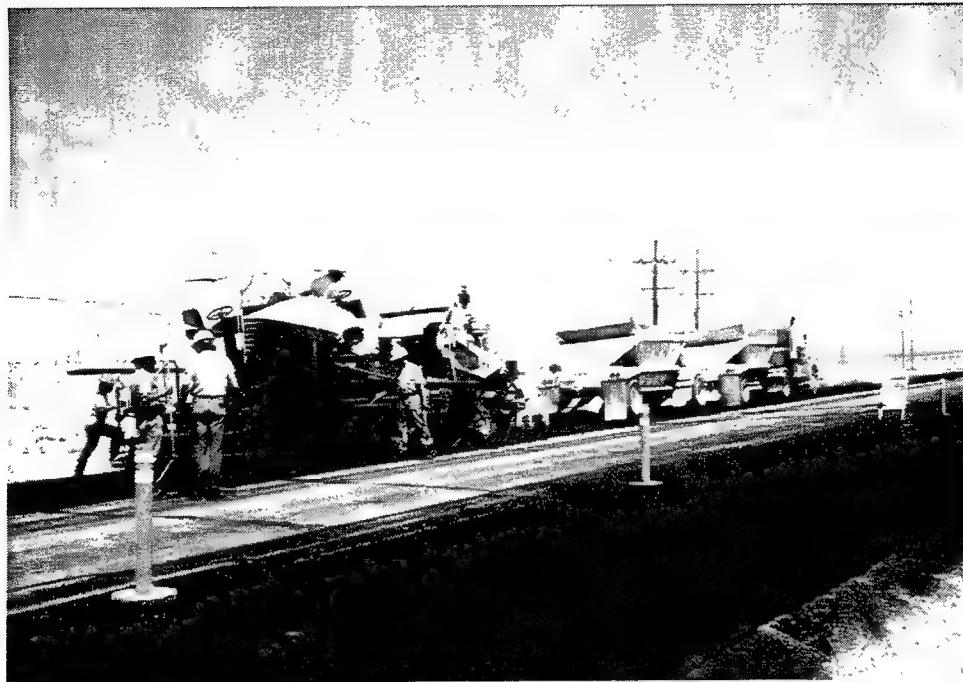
Belly-dump trucks placing SMA mixture in front of the paver
